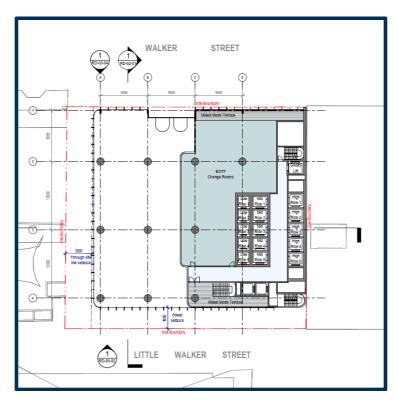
Proposed End of Trip facilities in 1st floor podium level
